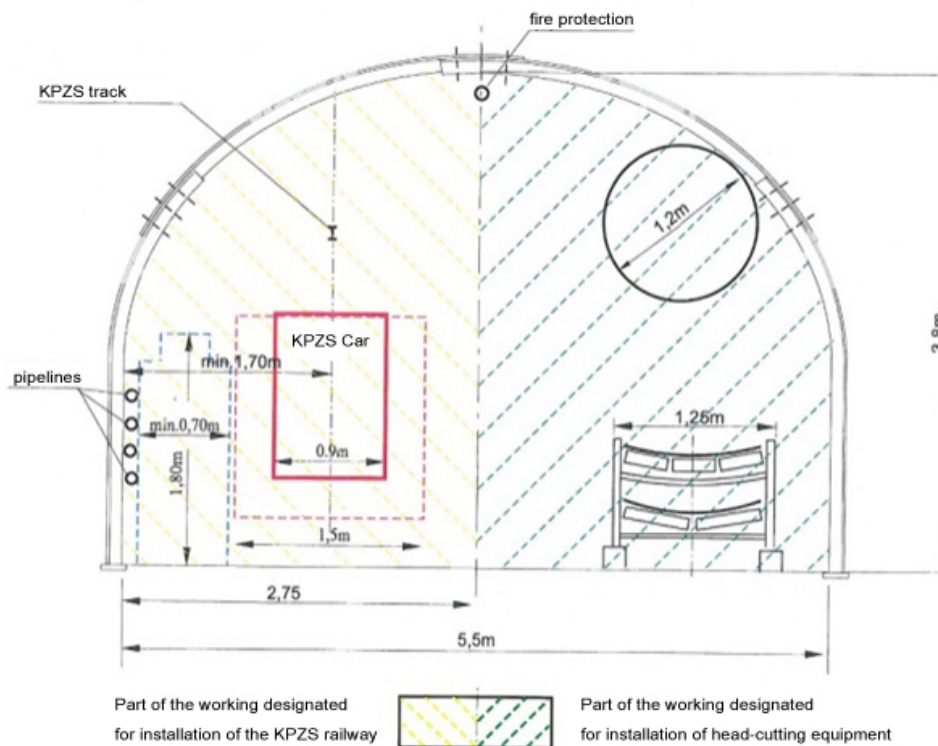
Cross-section of the working with equipment constructed of a V/10 support [2]
